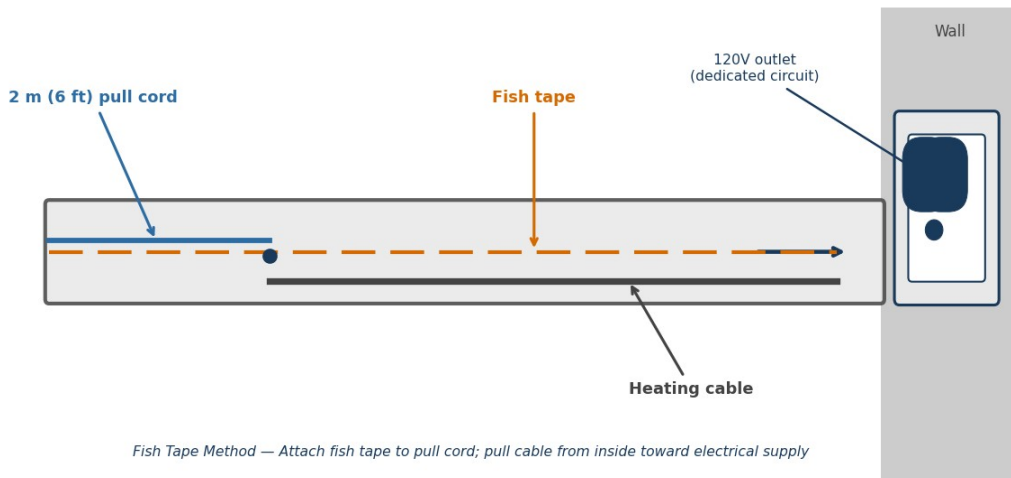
Fish tape method: attach fish tape to pull cord and draw cable through from inside
